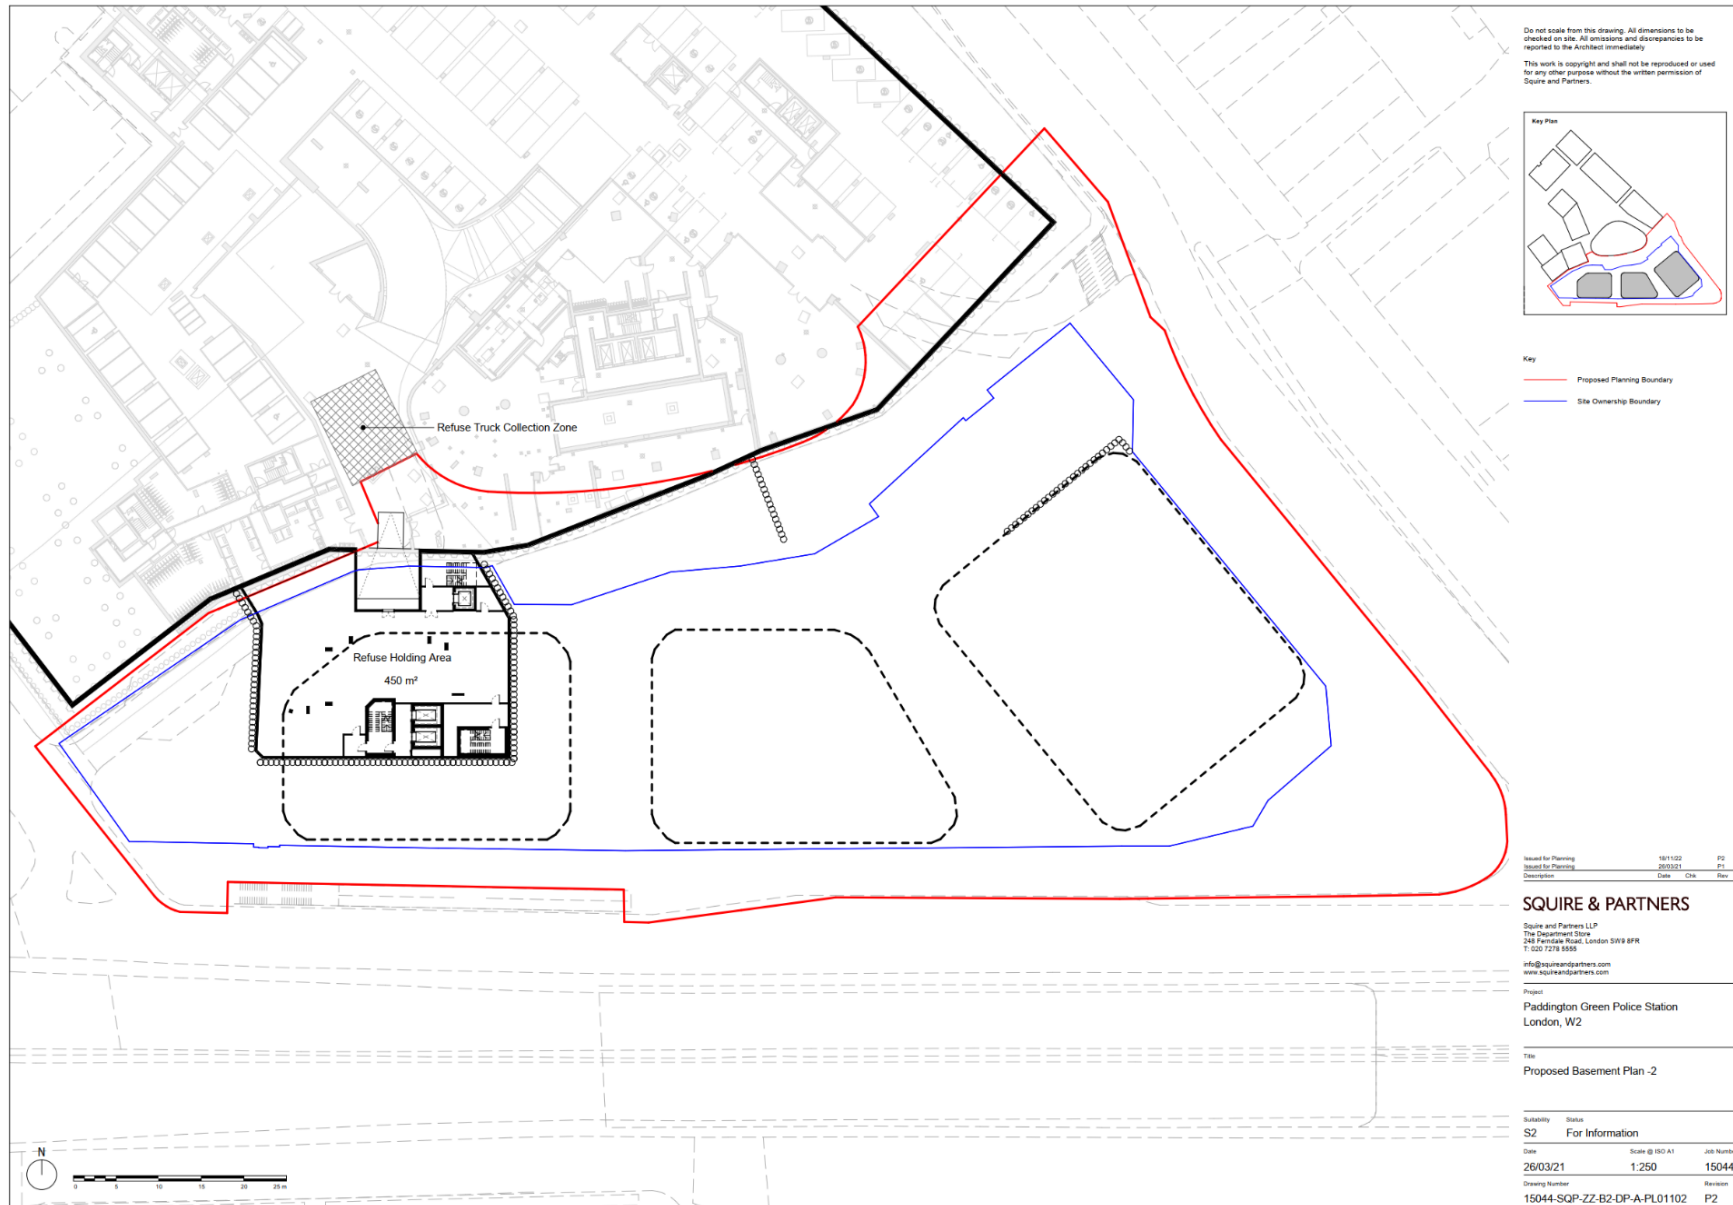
2022 Amended Proposed Development Basement Level 2 Plan
